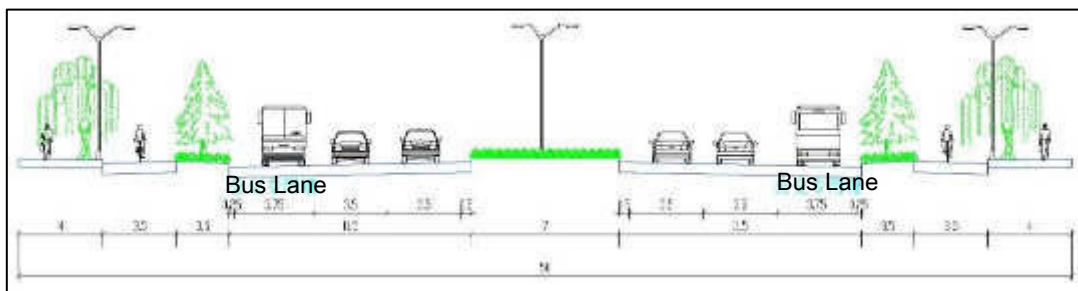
Cross-section of proposed 40 m wide road (HG)
